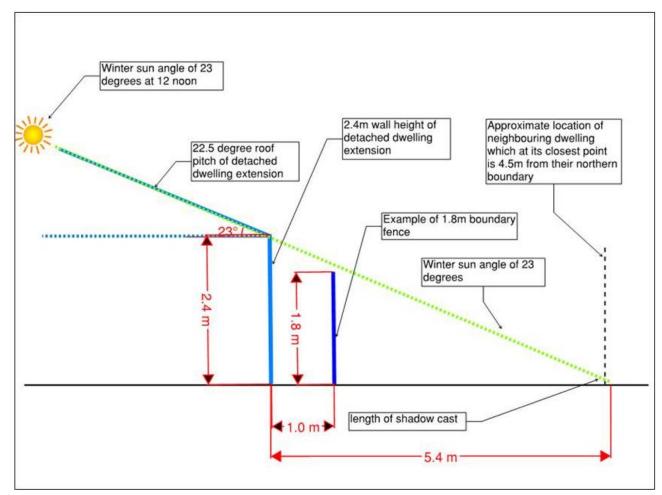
Example of shadowing impact from the proposed detached dwelling extension to 22 Hilltop Avenue, Devonport (Planning Officer, 2019)
